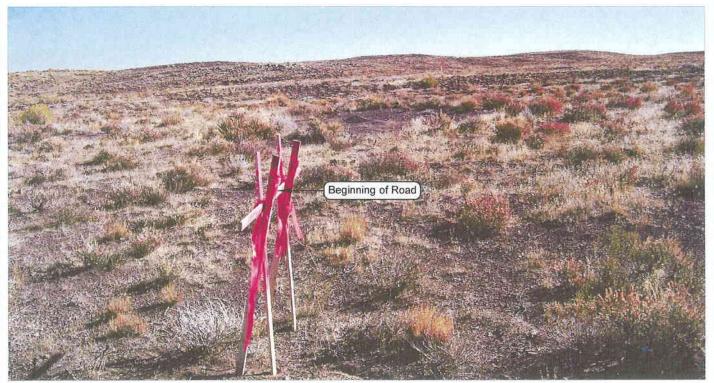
PHOTO VIEW: FROM BEGINNING OF PROPOSED ROAD
